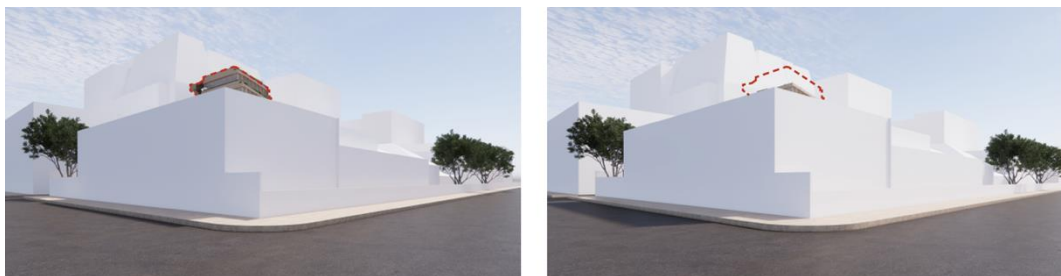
Artist's impression of previously advertised (left) and revised (right) development, viewed from the corner of Albert Street and Brighton Street
